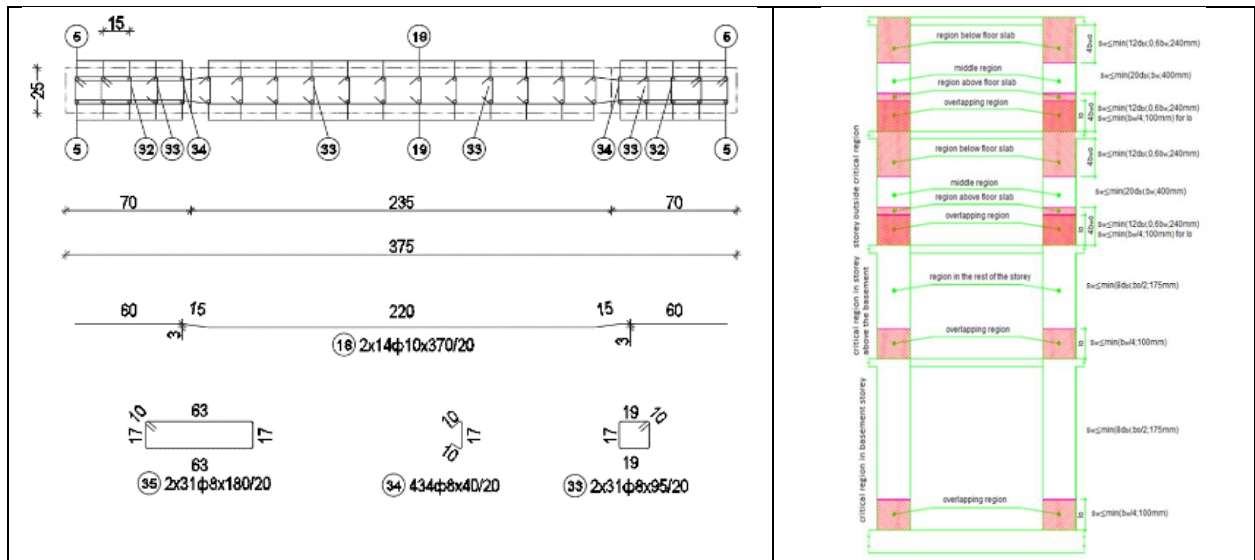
Shear wall section detail from project design of S. Stoykov (left image) (a) [1], shear wall detailing according to [7] (right image) (b)
